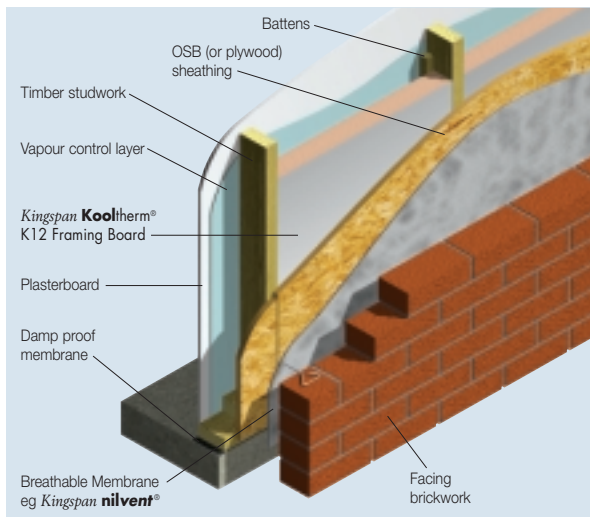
Brick Faced Timber Frame Wall (Insulation Between Studs)
